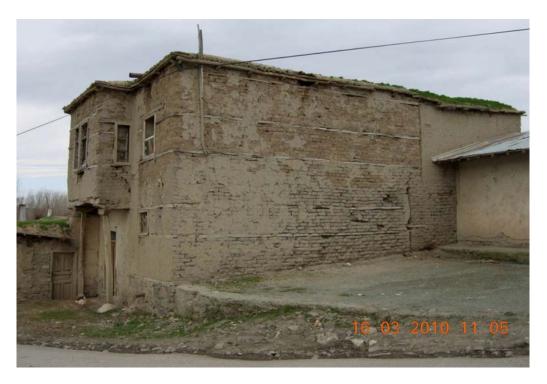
Outside view of two storey soil brick house in Kökan-Bayramyazı
